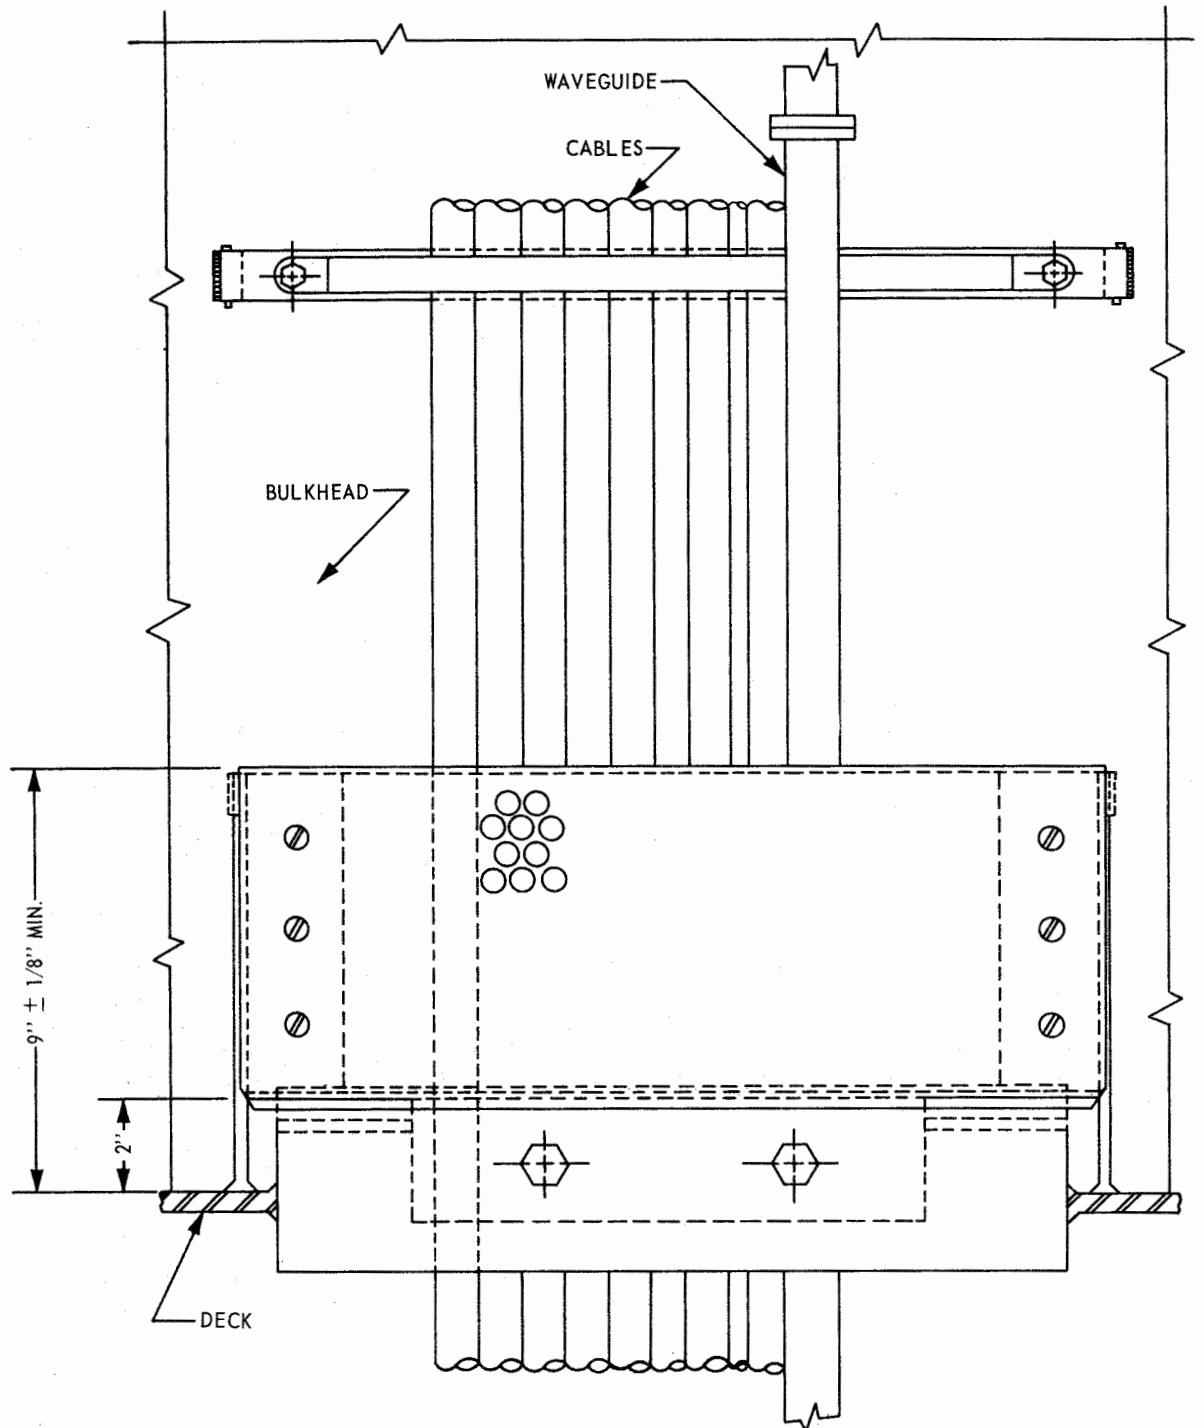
Protective Enclosure for Deck Penetration-Front Elevation View
